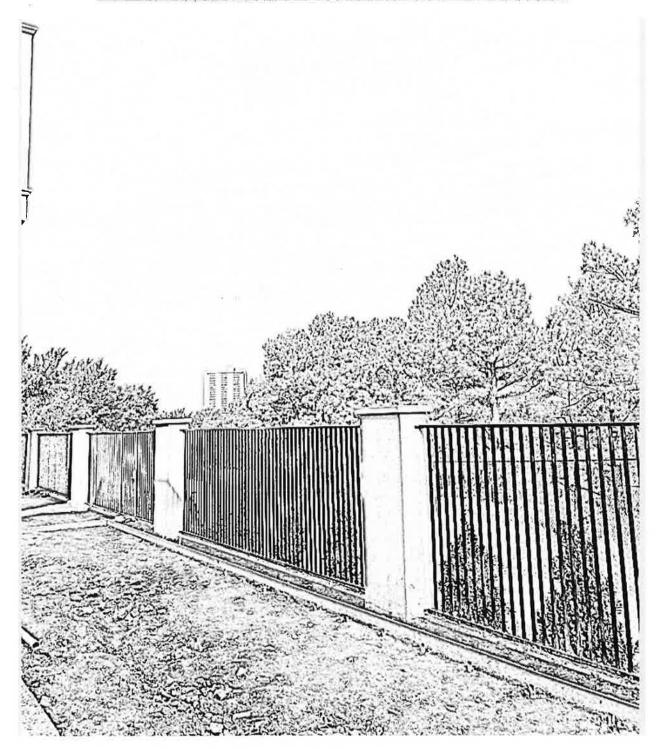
" - Conceptual Wall / Fence Diagrams (North Elevation)
